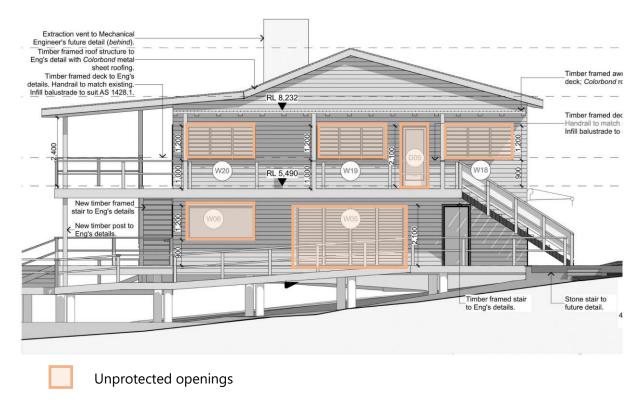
Openings on Main Building Southern Wall within 3m of Crown Boundary / Site Boundary
